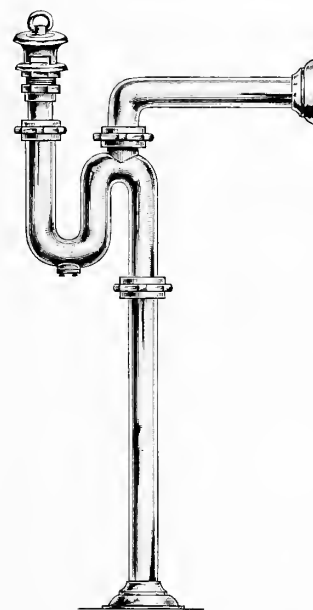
ECLIPSE TRAP, WITH EXTENSIONS TO FLOOR AND WALL, WITH FLANGES.
